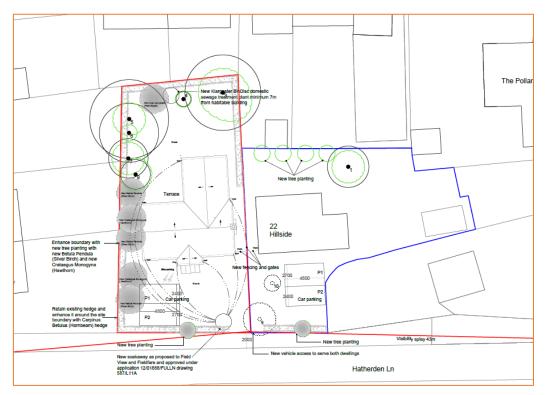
Proposed site plan (Source: Luke Rose Architect)
